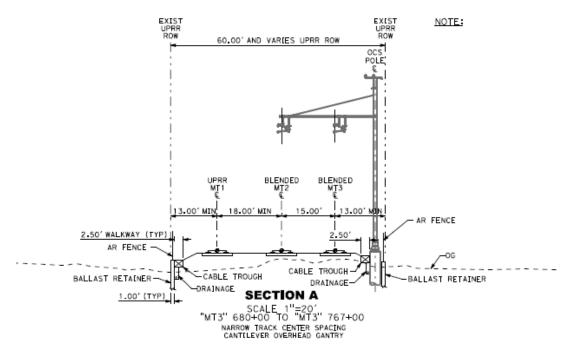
Typical Section in Subsection Monterey Corridor (Blended At-Grade)
